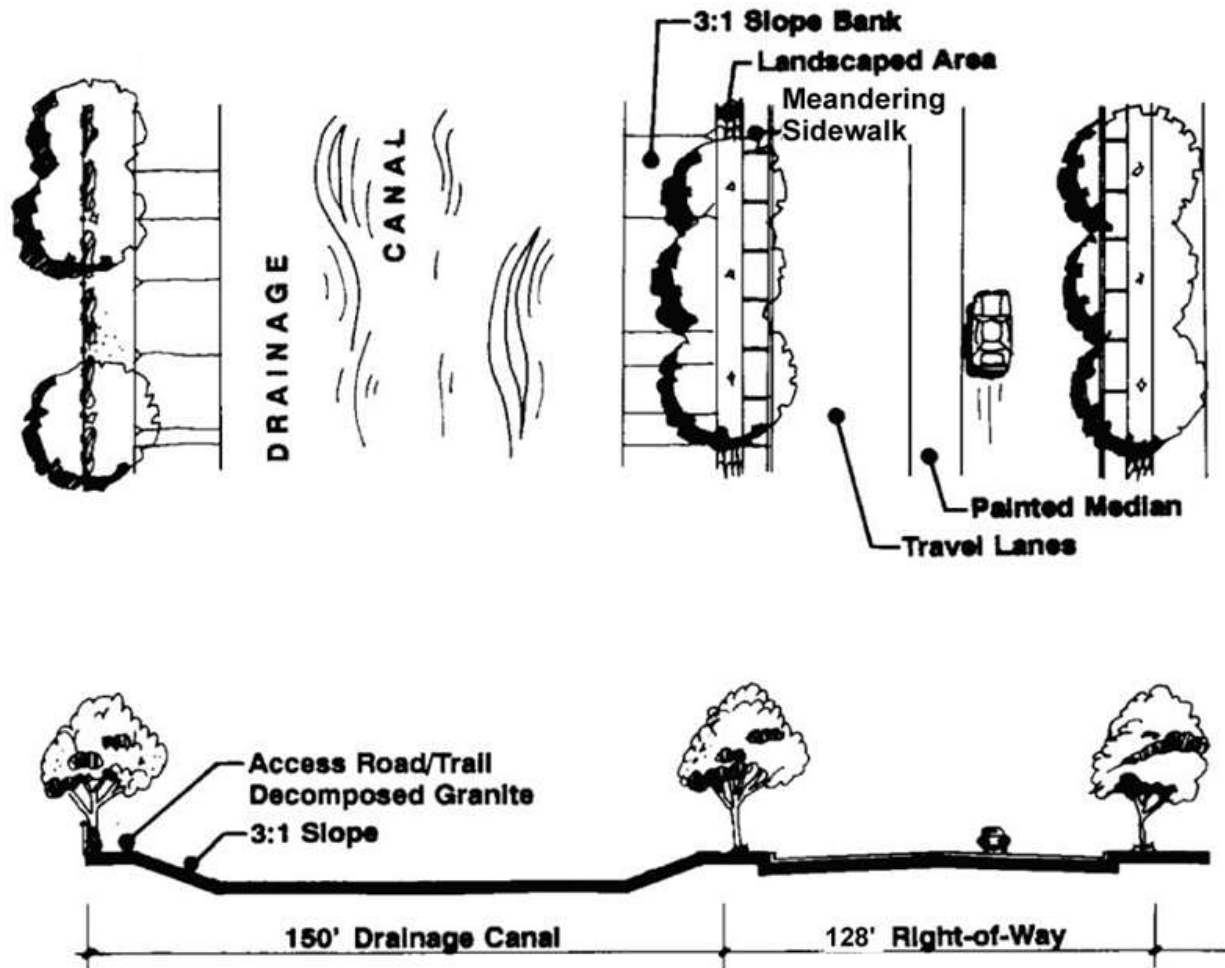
, Arterial Streetscape 2, Polk Streetscape 2B depicts the project edge where the drainage facilities about Polk Street.
